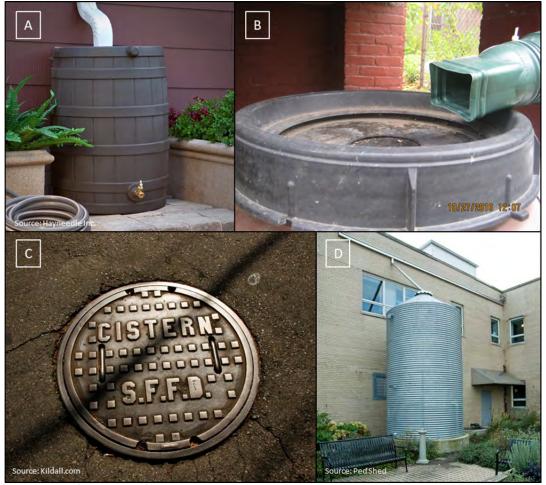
(A) Side view of rain barrel. (B) Downspout draining into rain barrel (C) Manhole for underground cistern. (D) Above-ground cistern
